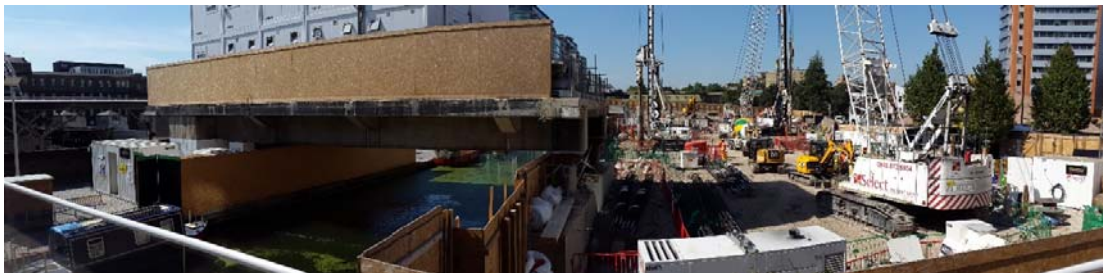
Panoramic View of the Modified Bridge and The Site Preparing for Piling
